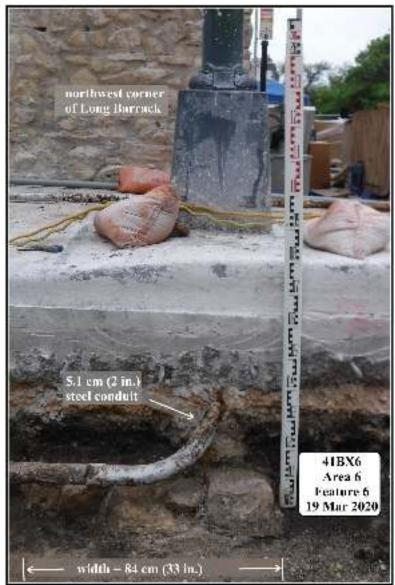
Feature 6, likely a Spanish Colonial wall footing (41BX6), view south.
